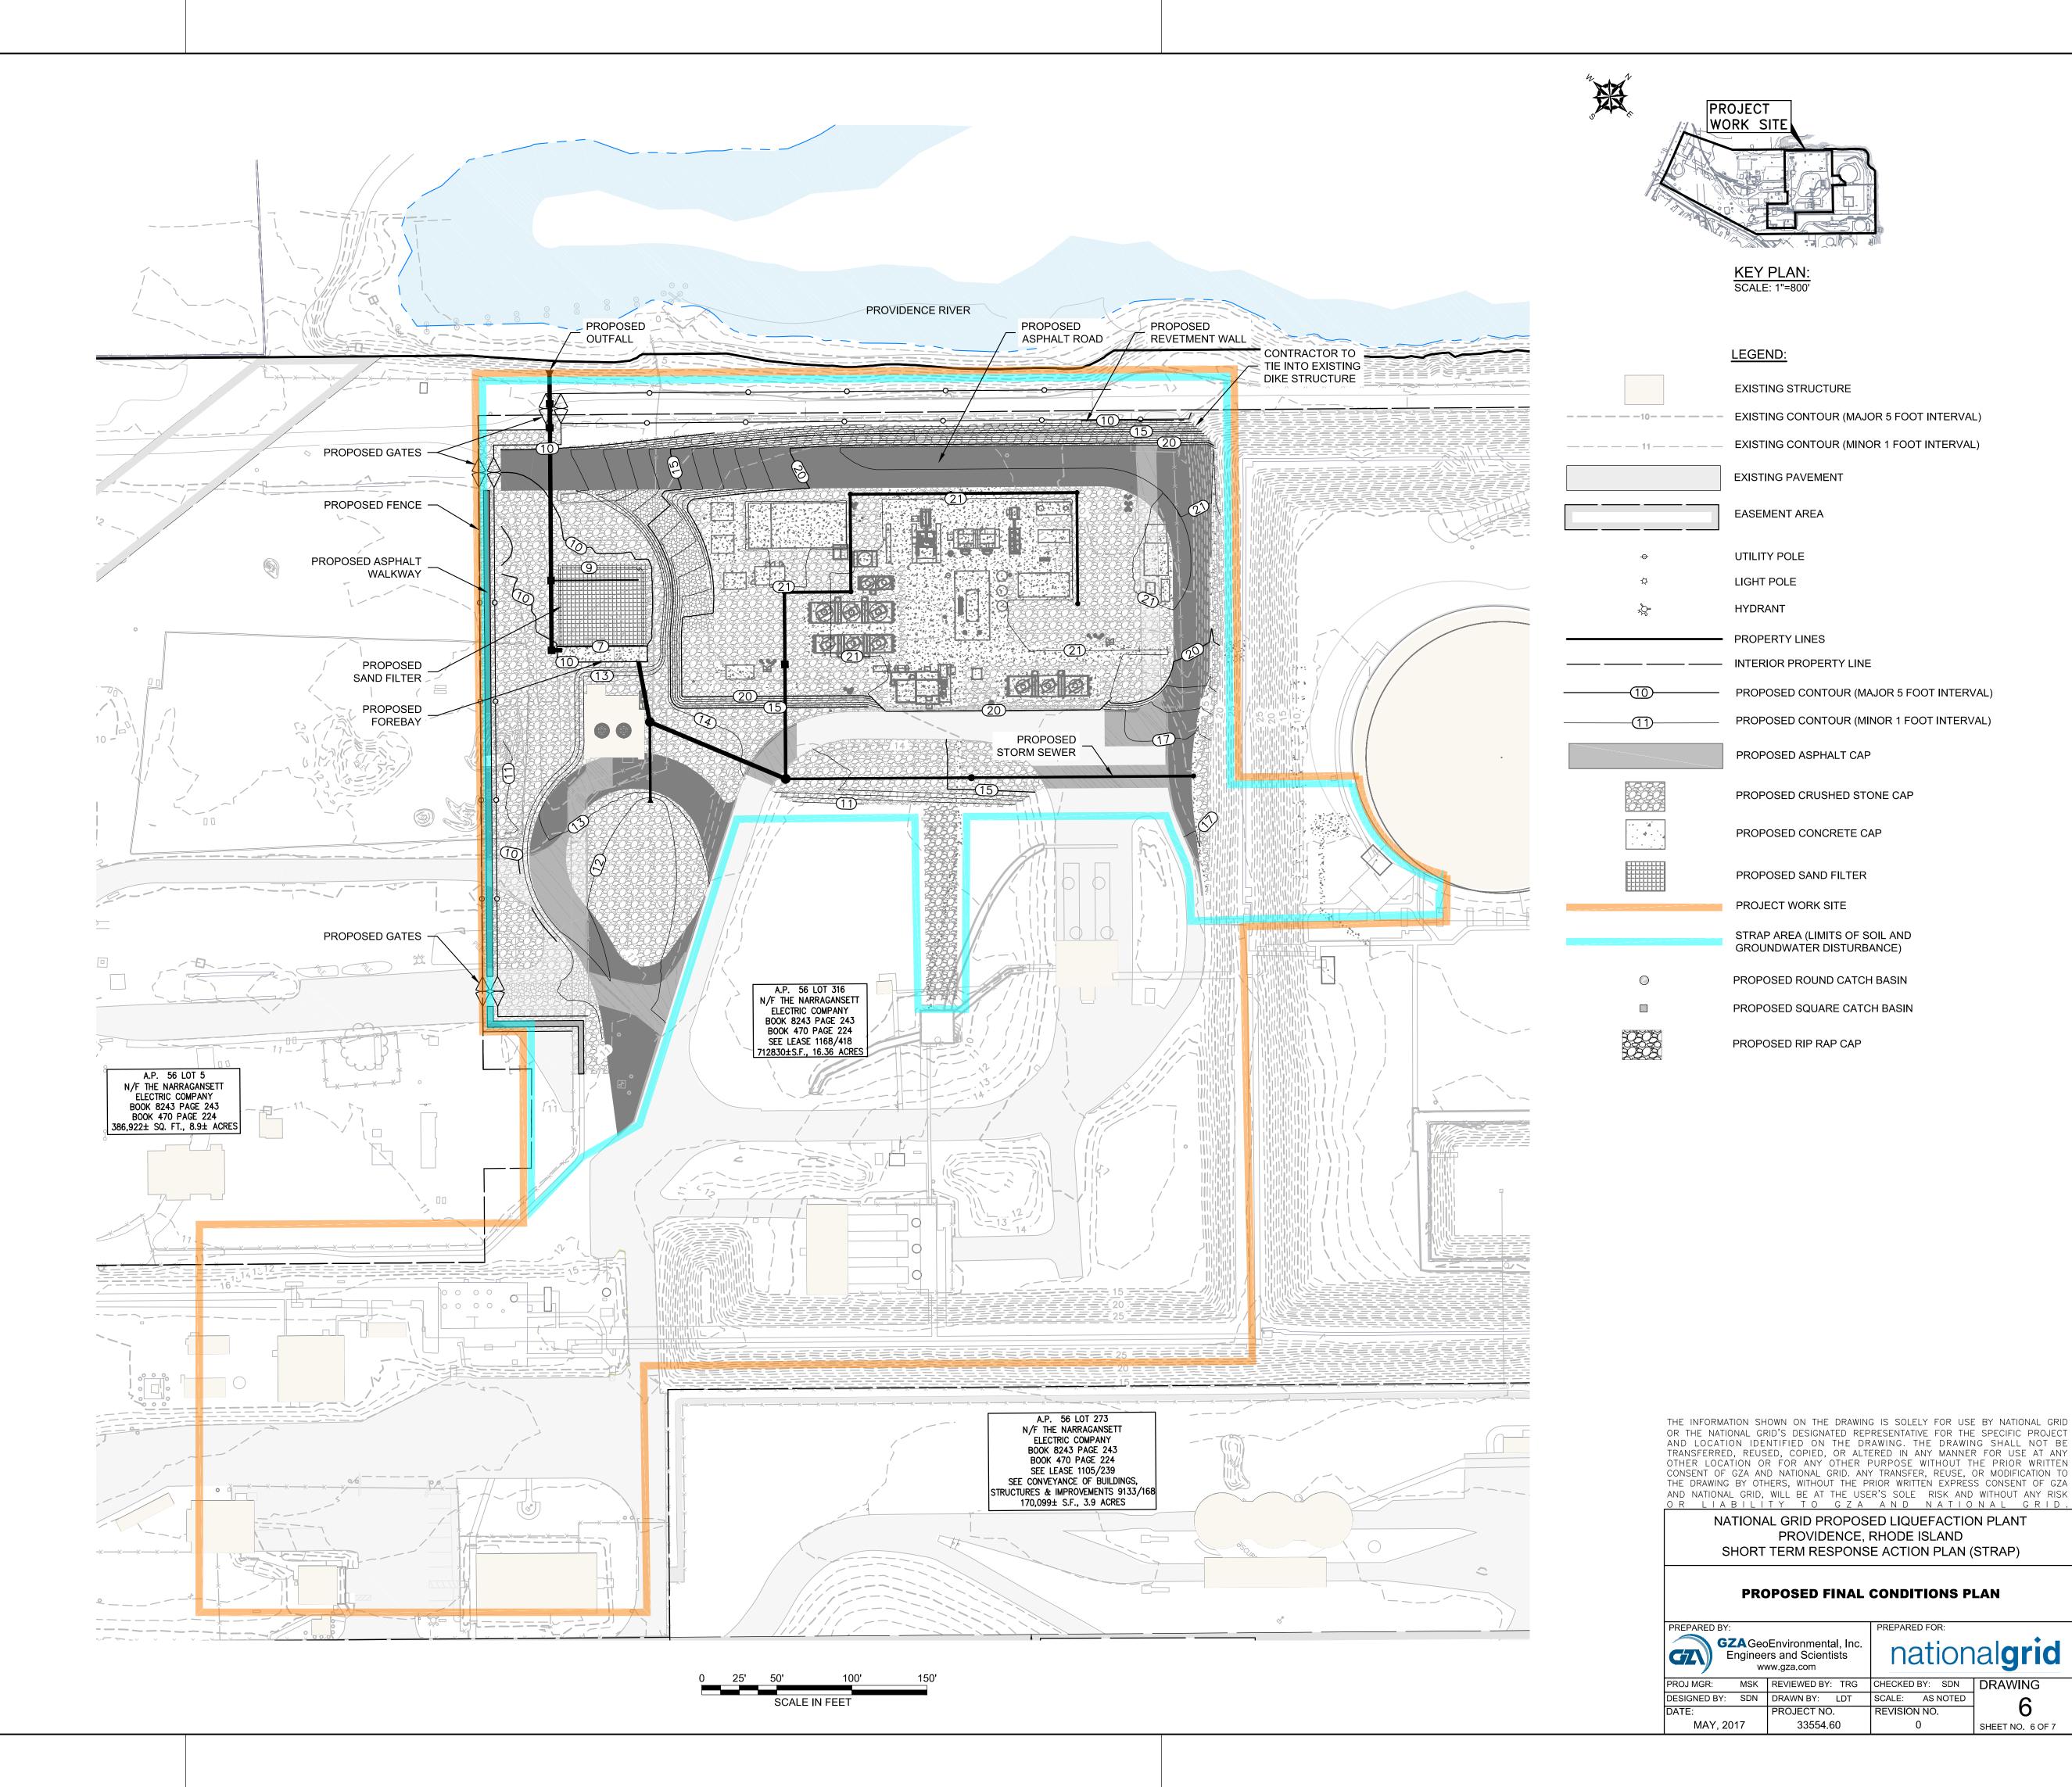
, PROPOSED FINAL CONDITIONS PLAN (FROM THE MAY 2017 STRAP)
